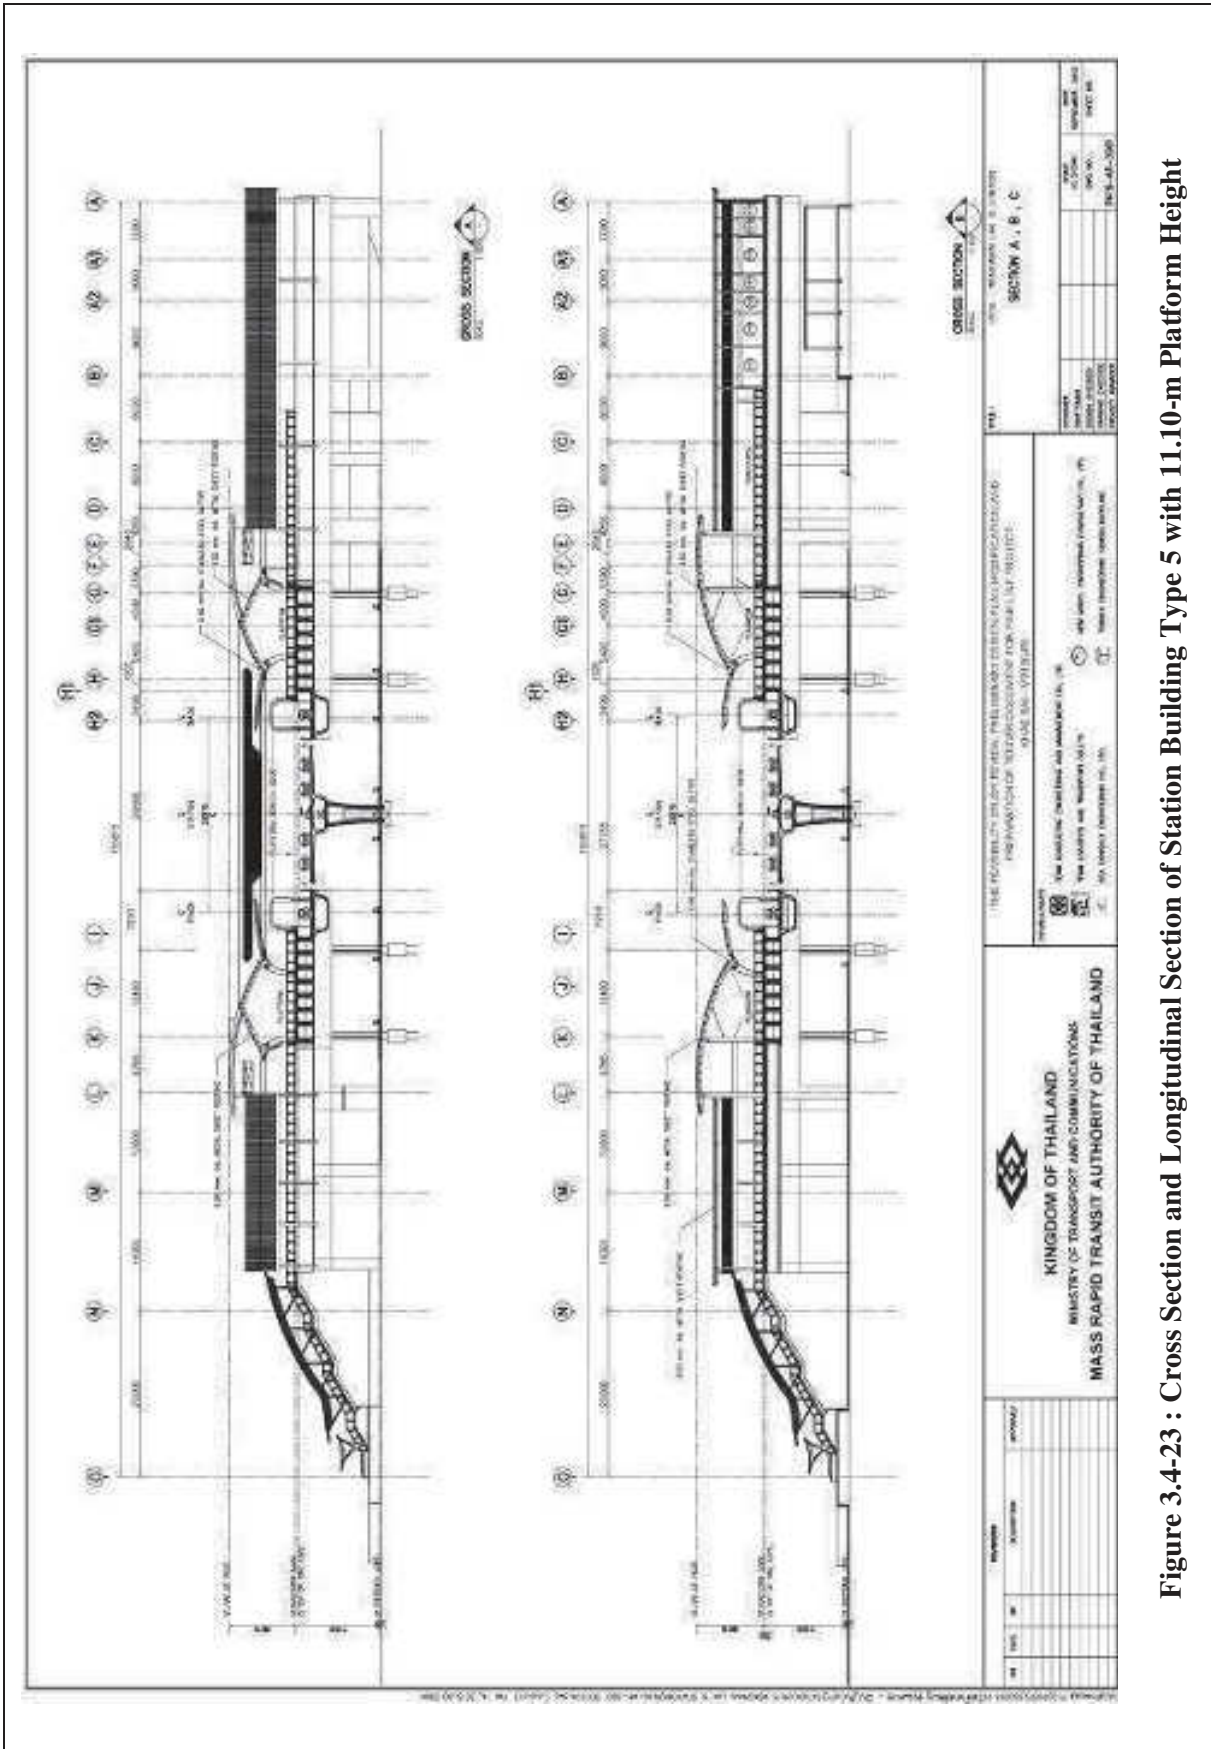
Cross Section and Longitudinal Section of Station Building Type 5 with 11.10-m Platform Height
